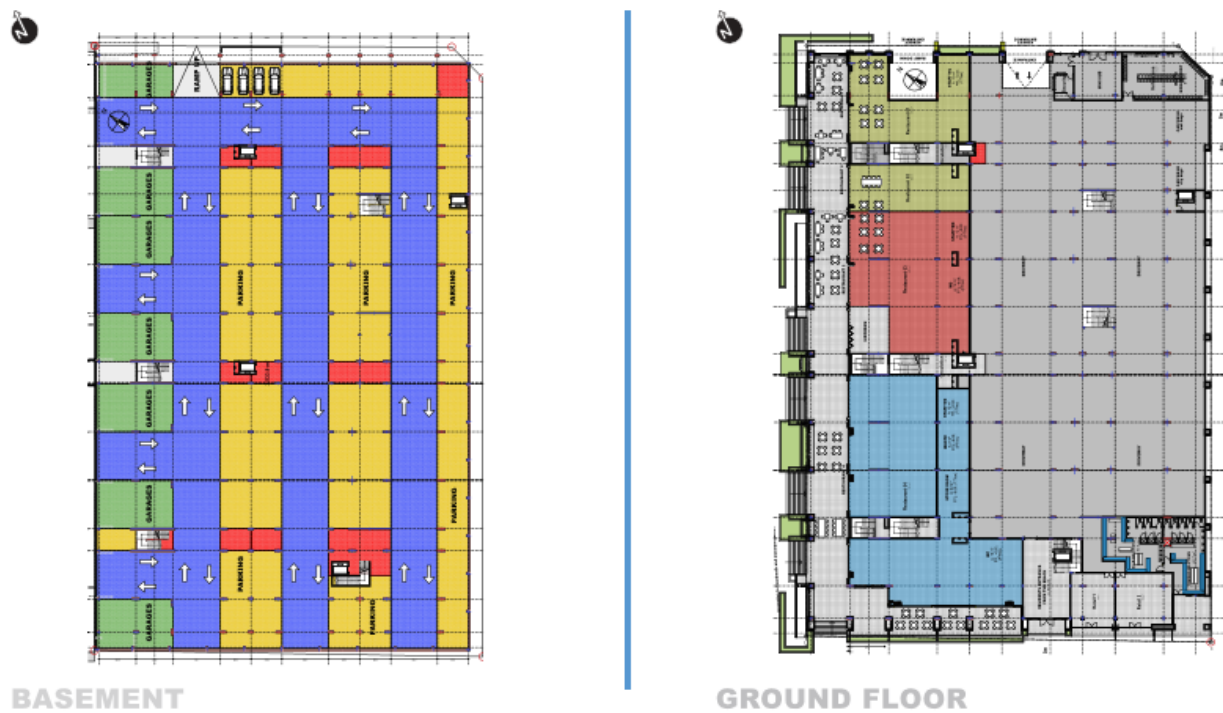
BASEMENT AND GROUND FLOOR PARKING SPACES
